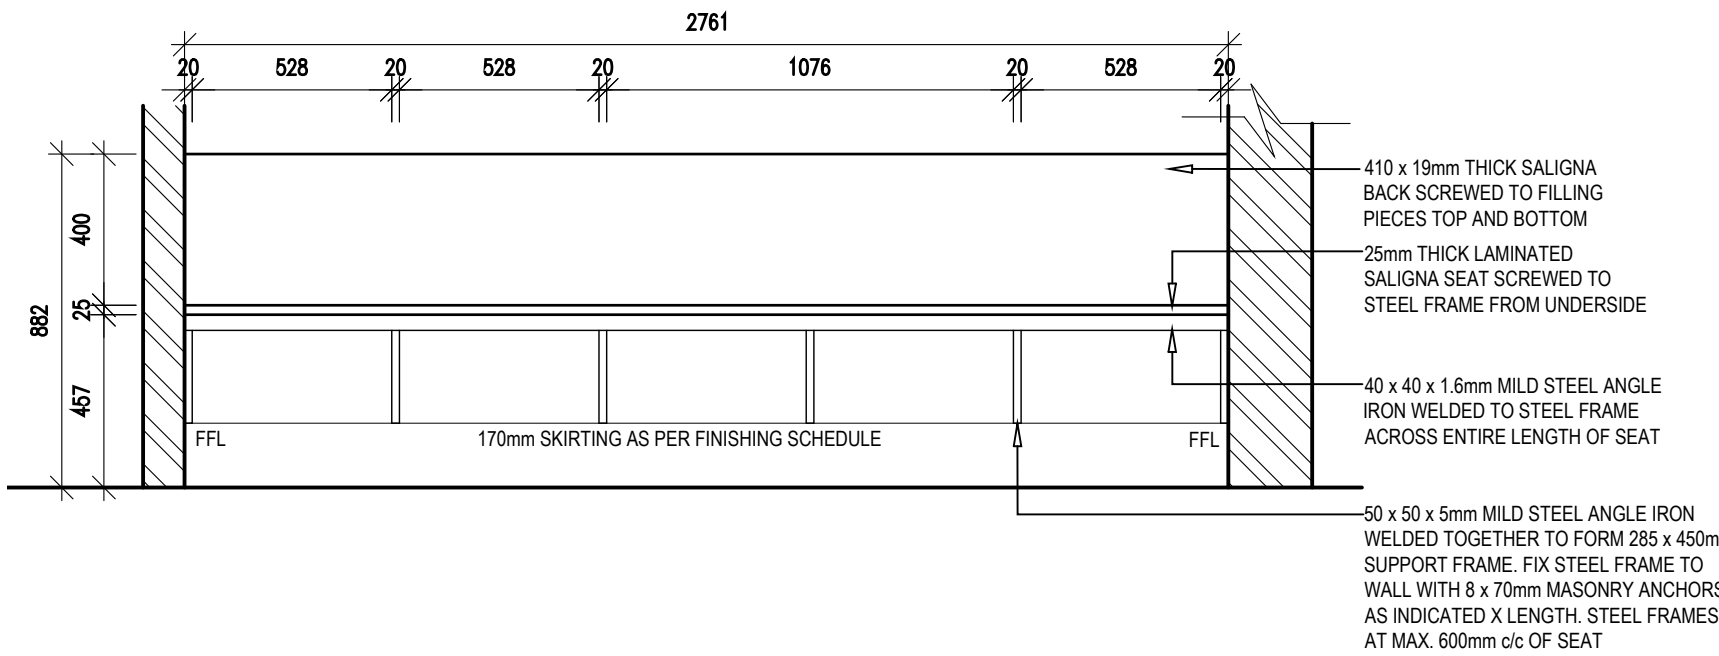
ENTRANCE FOYER SHELIVING- SECTION B
